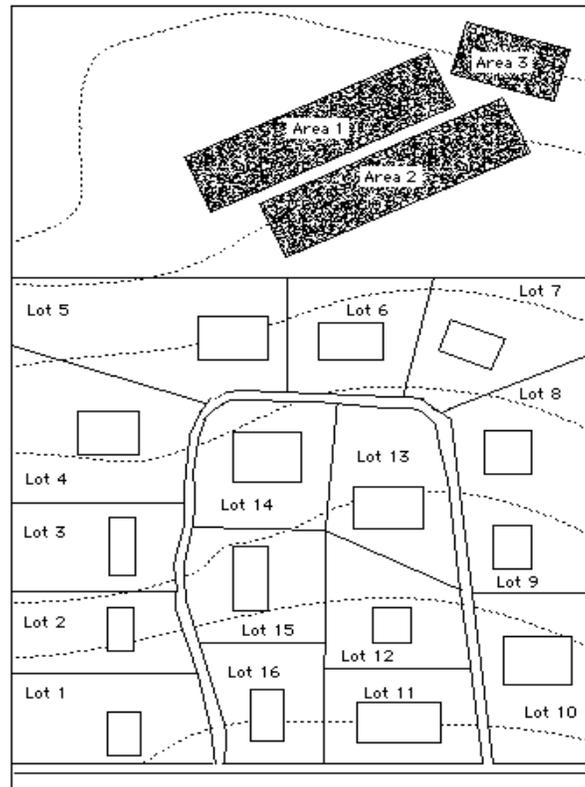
Siting of the proposed wastewater treatment system should fit in with the plan for the development.
